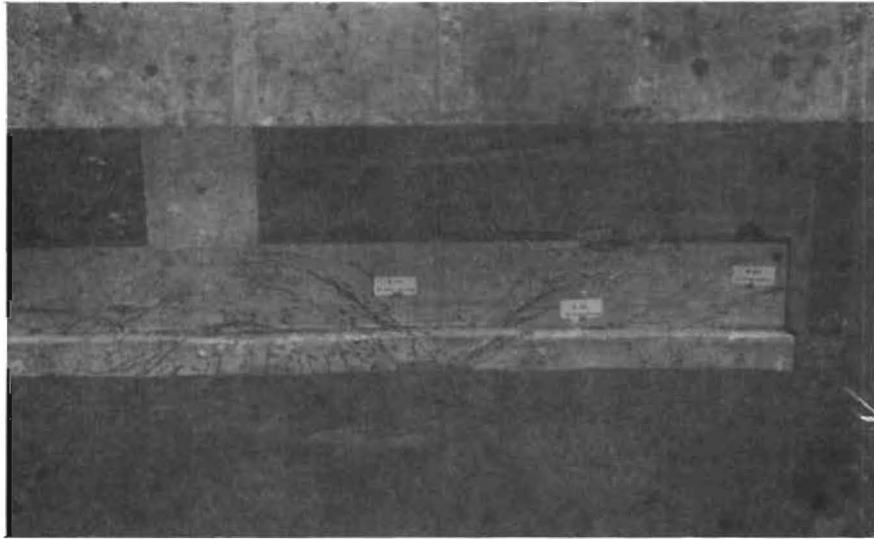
(a) Shear compression failure at the bottom of a cantilever beam.
